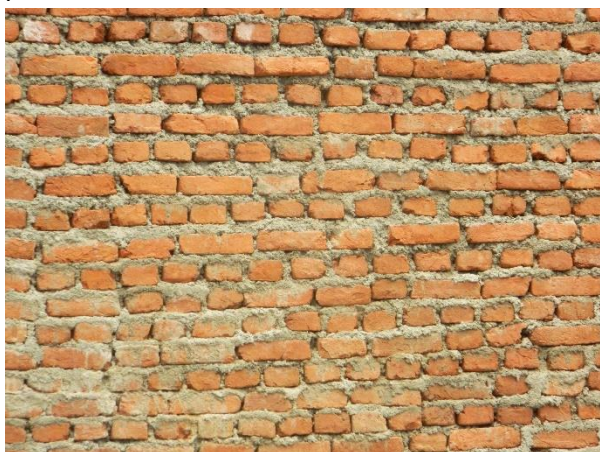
Brick masonry wall (Shock Safe Nepal group 1).
